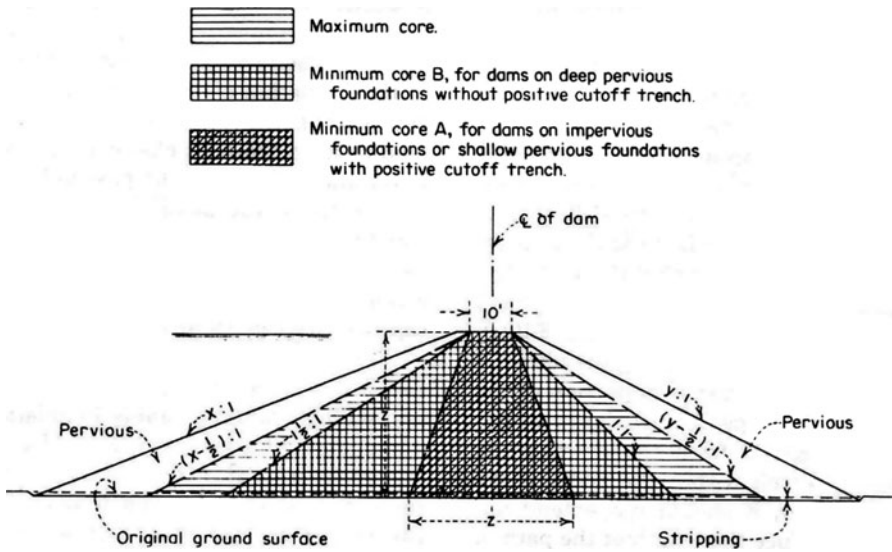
Size range of impervious cores used in zoned embankments.
